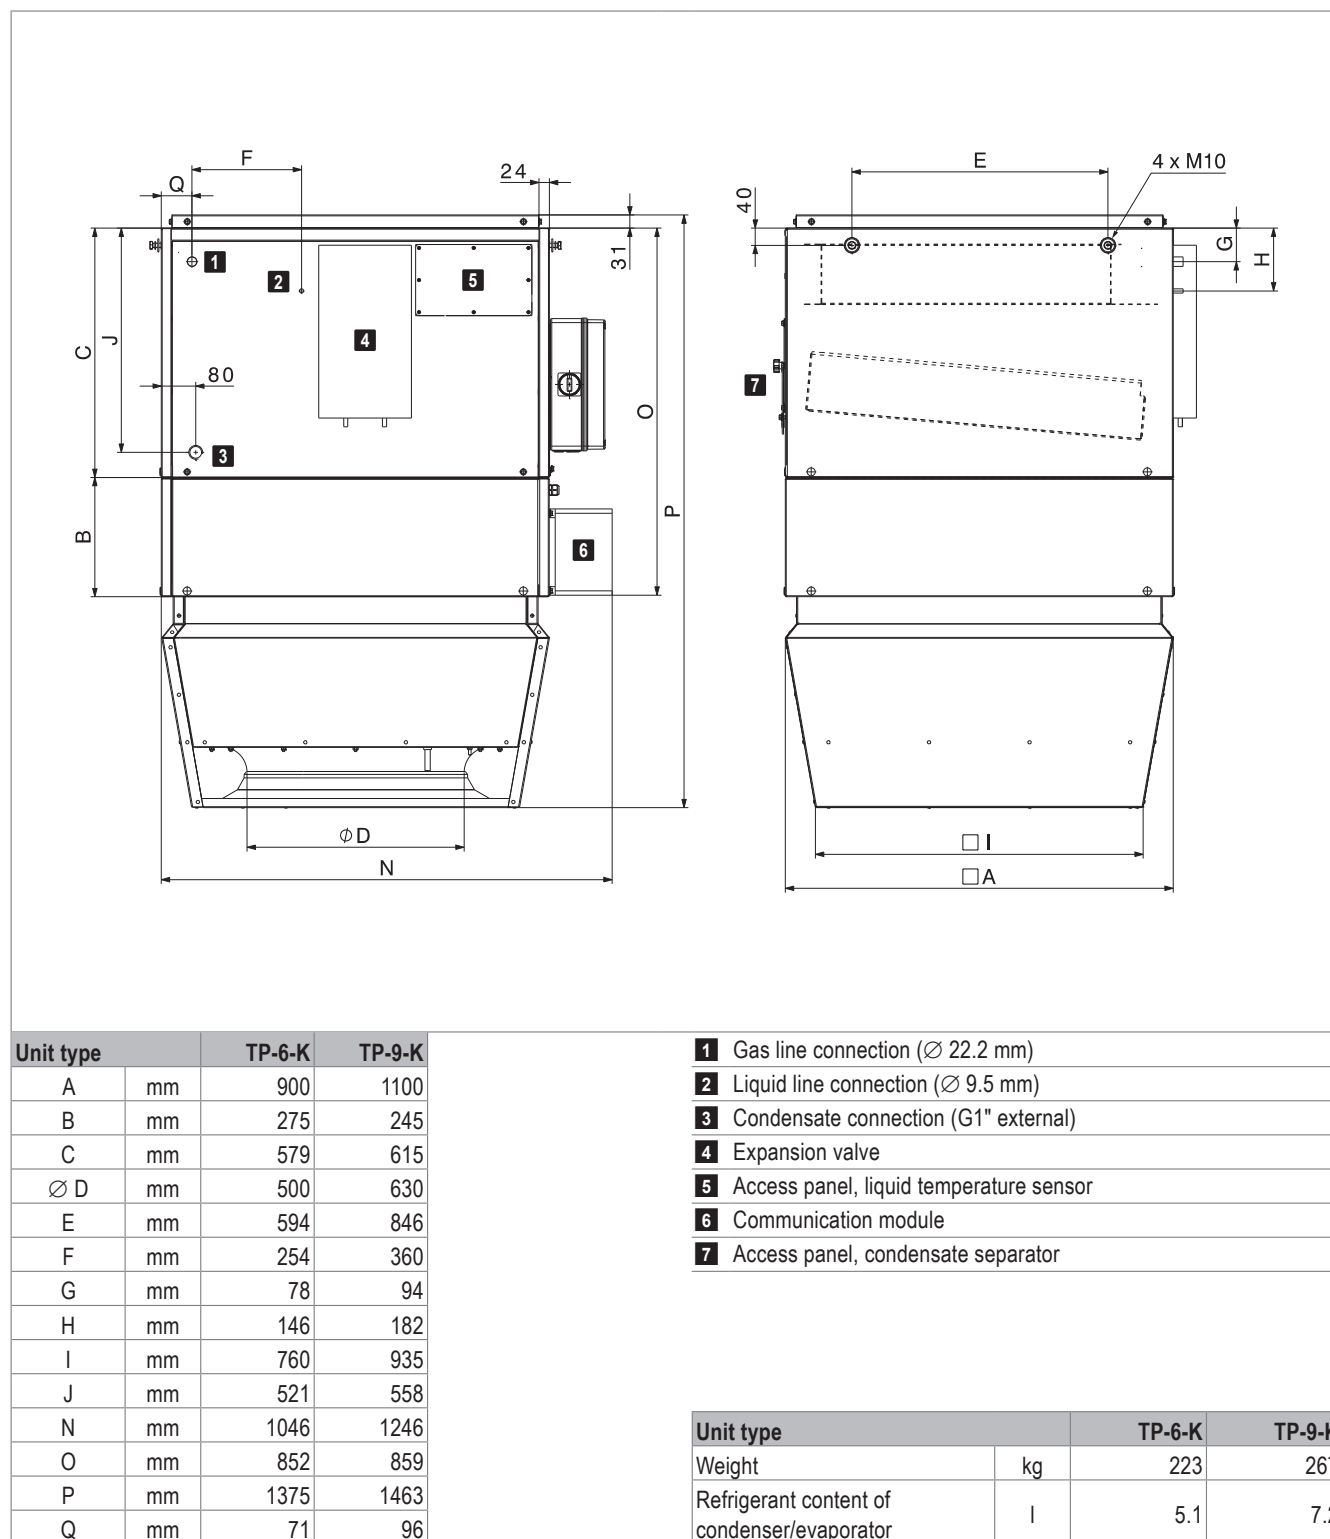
Dimensions and weights of the TopVent® TP-6-K, TP-9-K
